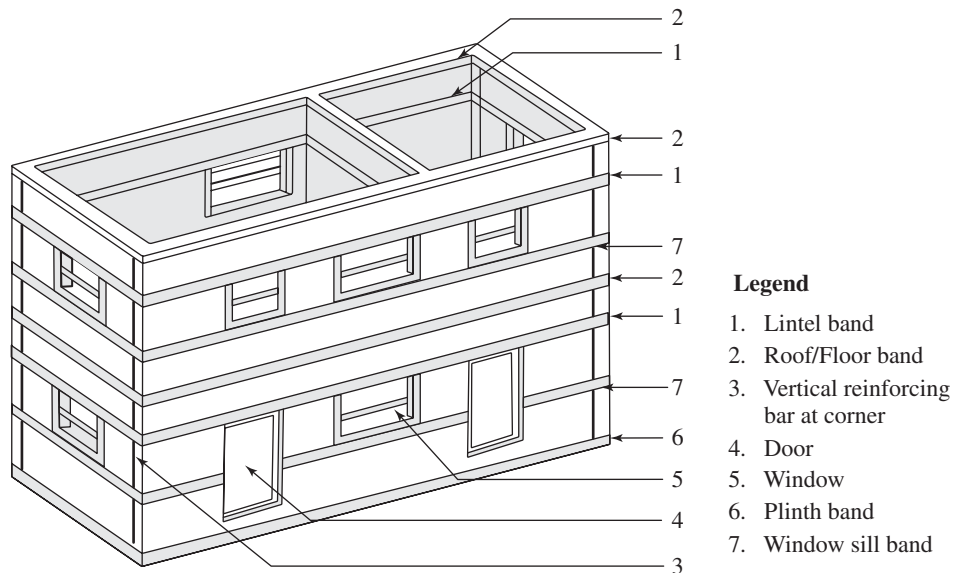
Vertical and horizontal bands in masonry walls to resist earthquakes
